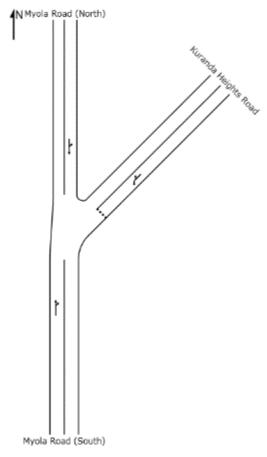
Myola Road / Kuranda Heights Road intersection layout.
